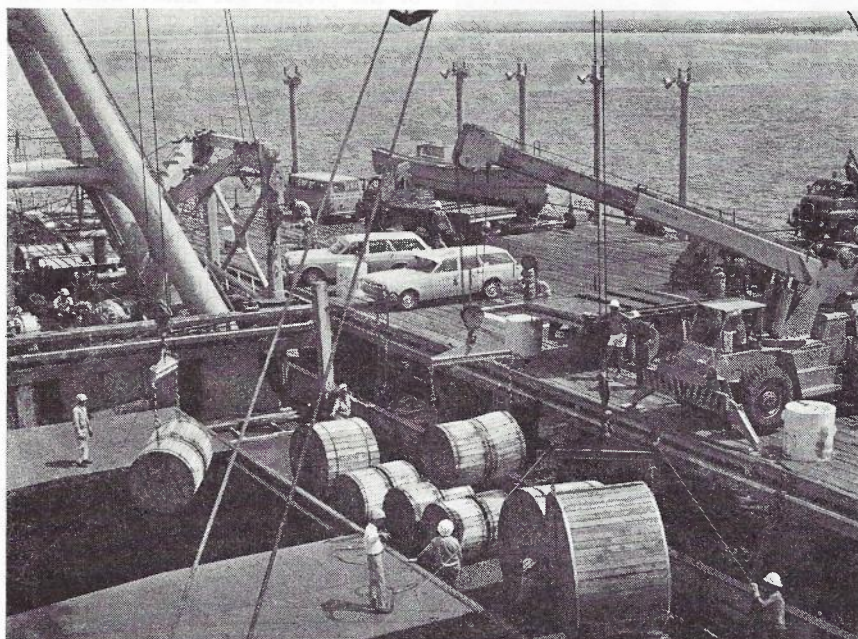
The U.S. Navy "Cherry Picker" Unloading Cable at Exmouth. Illustrating the Preferred Type of Crane.
